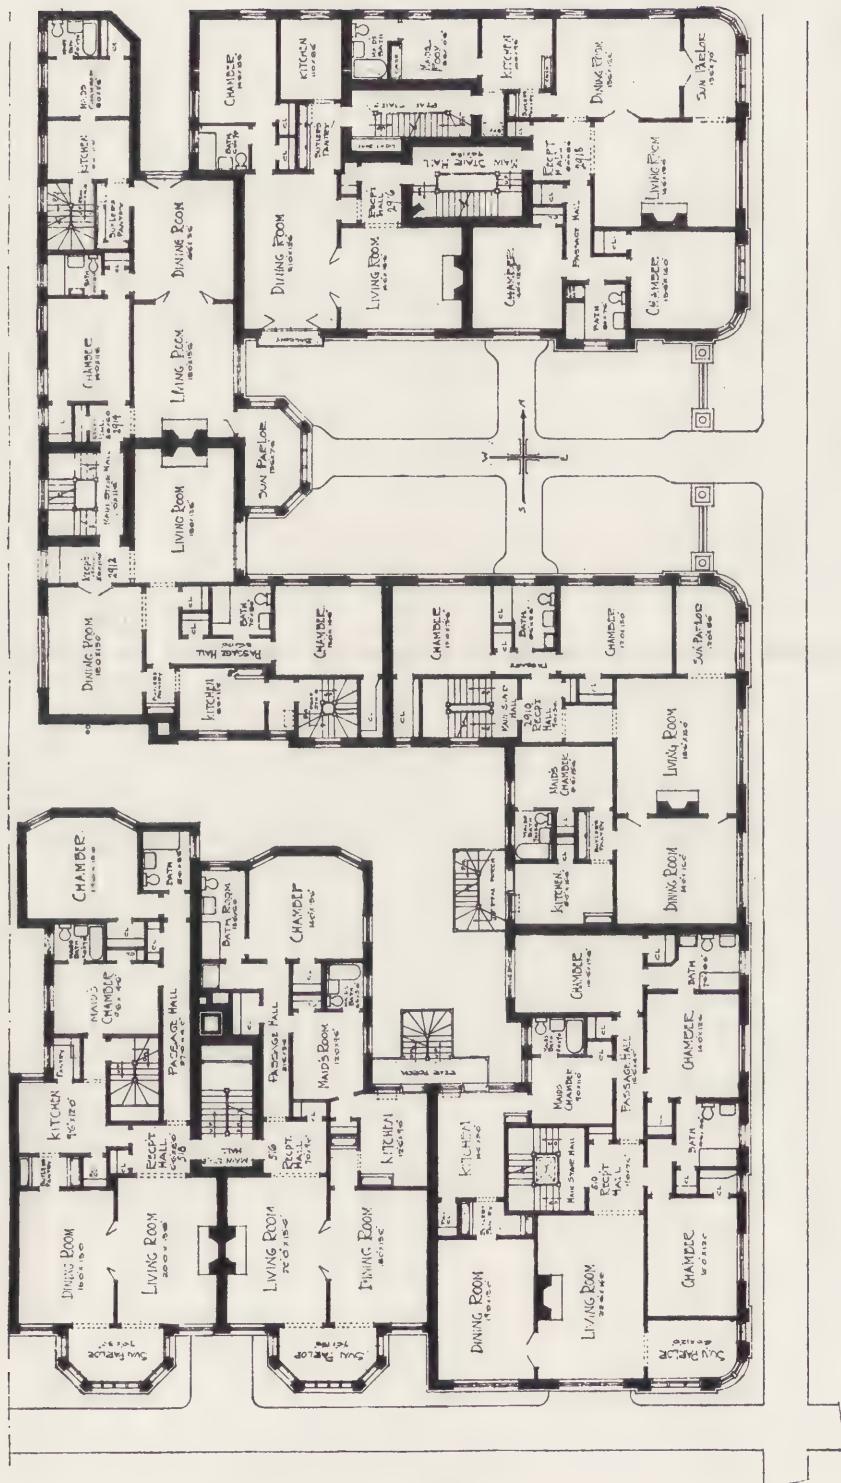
TYPICAL FLOOR PLAN. THE CHESTERFIELD APARTMENTS, SURF STREET AND PINE GROVE AVENUE, CHICAGO, ILL.
